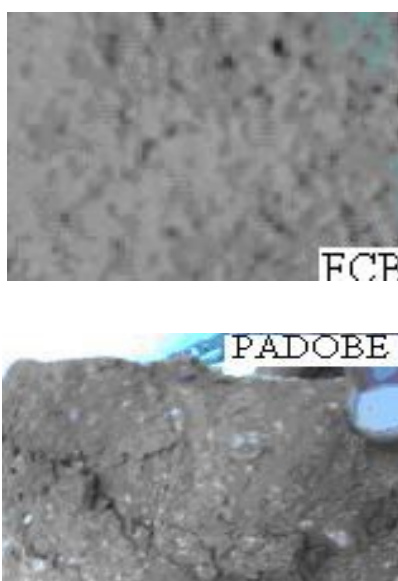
Inner structure of fibrous concrete brick and Padobe brick
